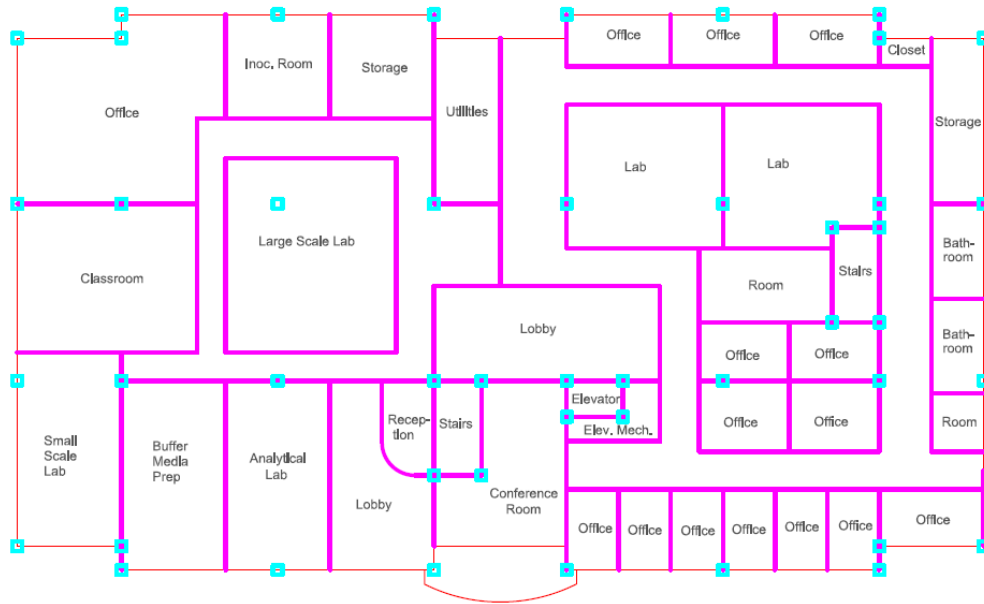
Floor Layout of the WPI Biomanufacturing and Education Center
